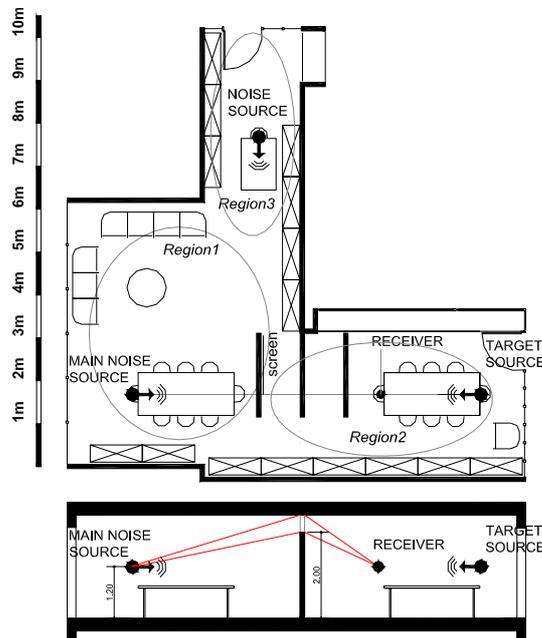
Ground floor and section of the room (ceiling height is 2.7 m)
